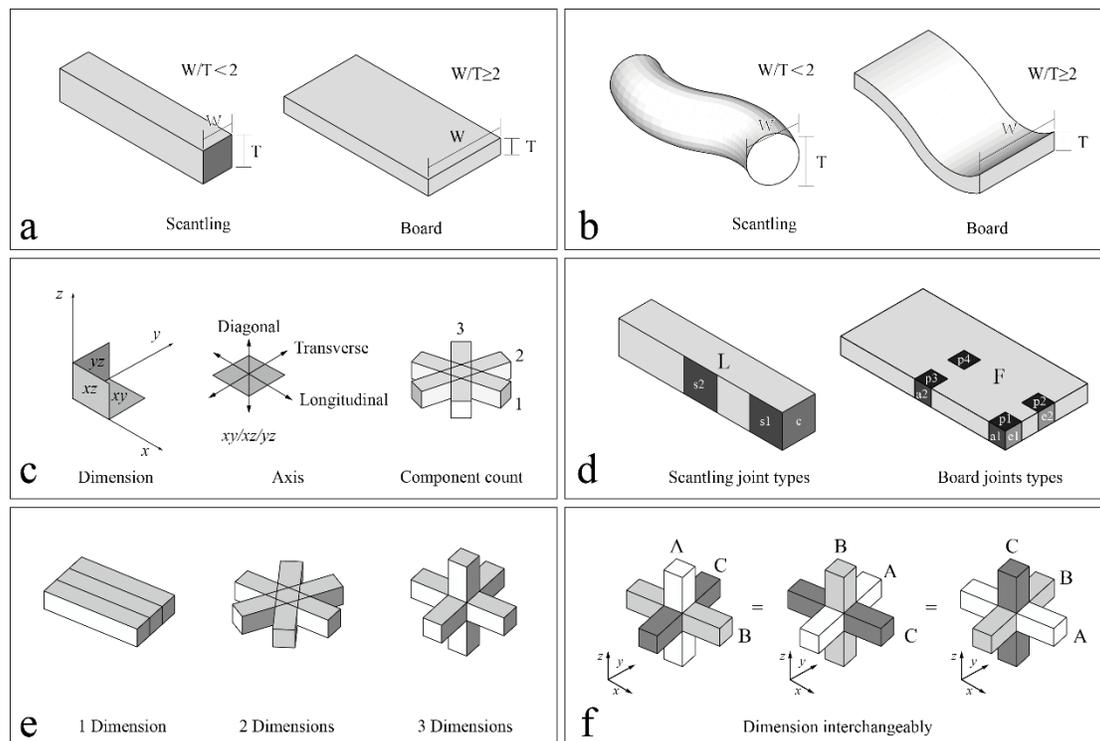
MT joint coding. (a) Categories of scantlings and boards based on their cross-sectional dimensional ratios; (b) Curved components classification; (c) Definition of dimension, axis and component count; (d) Joint types; (e) Component joint by different dimensions; (f) Dimension interchangeably
